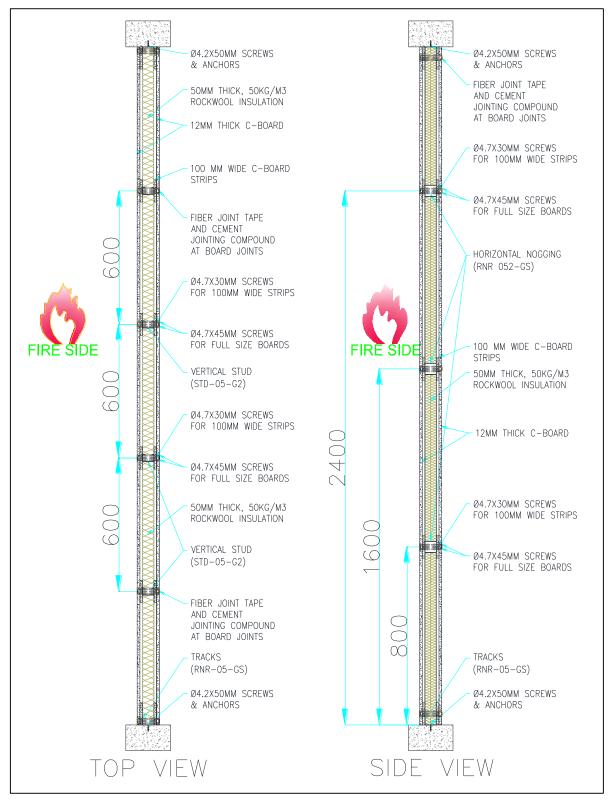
Top and Side section details of both the termination detail and intermediate fixing details. (Drawing produced by TBWIC)
